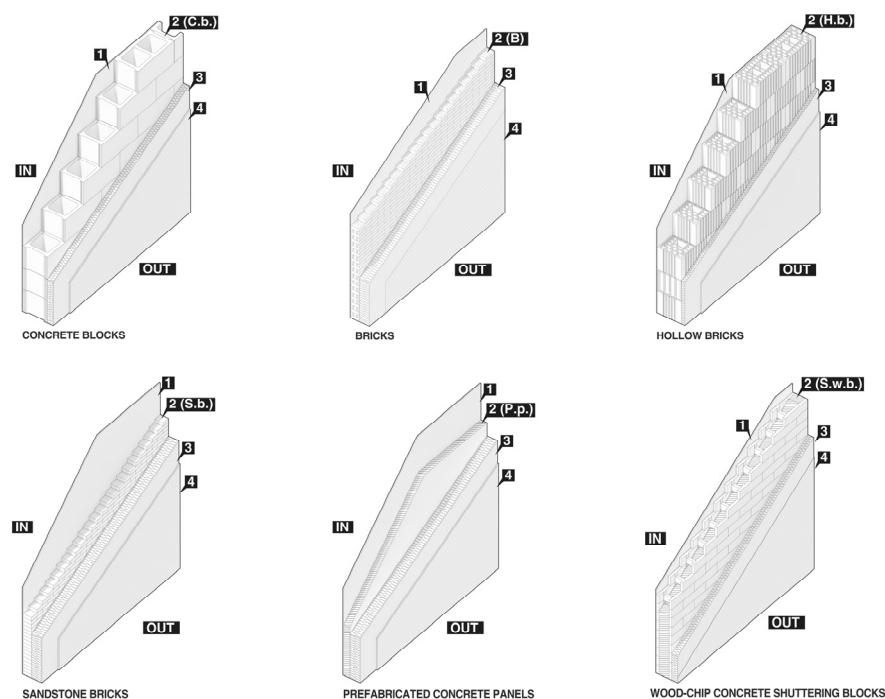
Wall types represented by stratigraphy that includes: 1 = Internal plaster; 2 = Wall building material (C.b. = Concrete block; B. = Bricks; H.b. = Hollow bricks; S.b. = Sandstone bricks; S.w.b. = Shuttering wood chips blocks; P.p. = Prefabricate concrete panels); 3 = Thermal insulation (EPS); 4 = External plaster.
